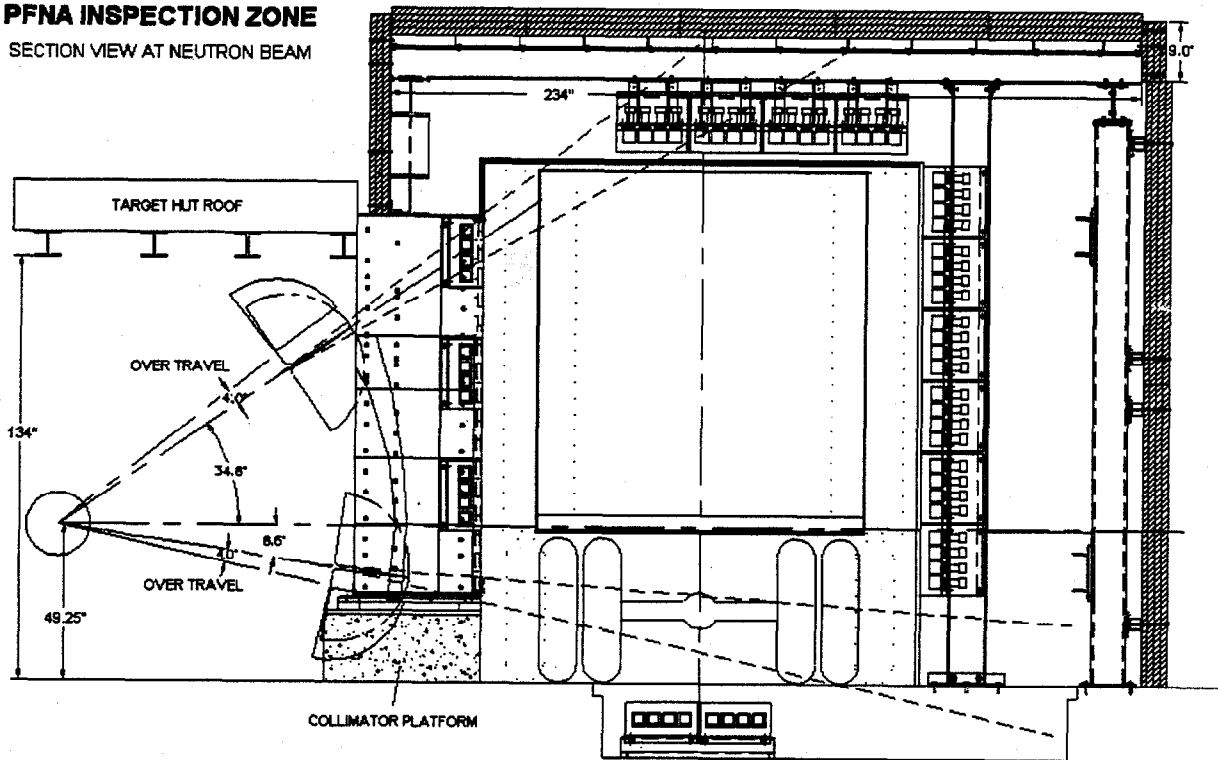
Elevation view of the PFNA Facility at the beam line plane.
